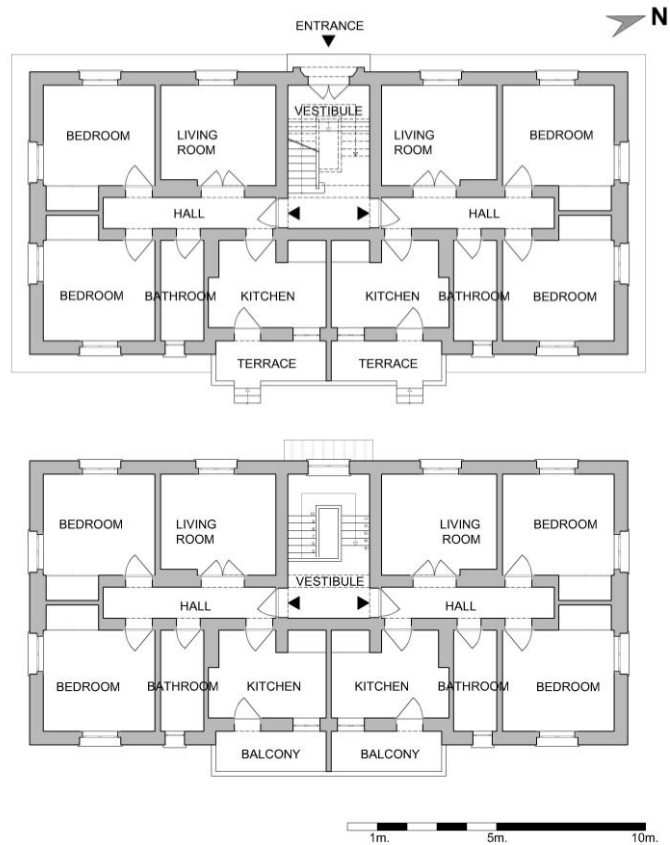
Ground floor and first floor plans of Employee Dwelling Type 1
